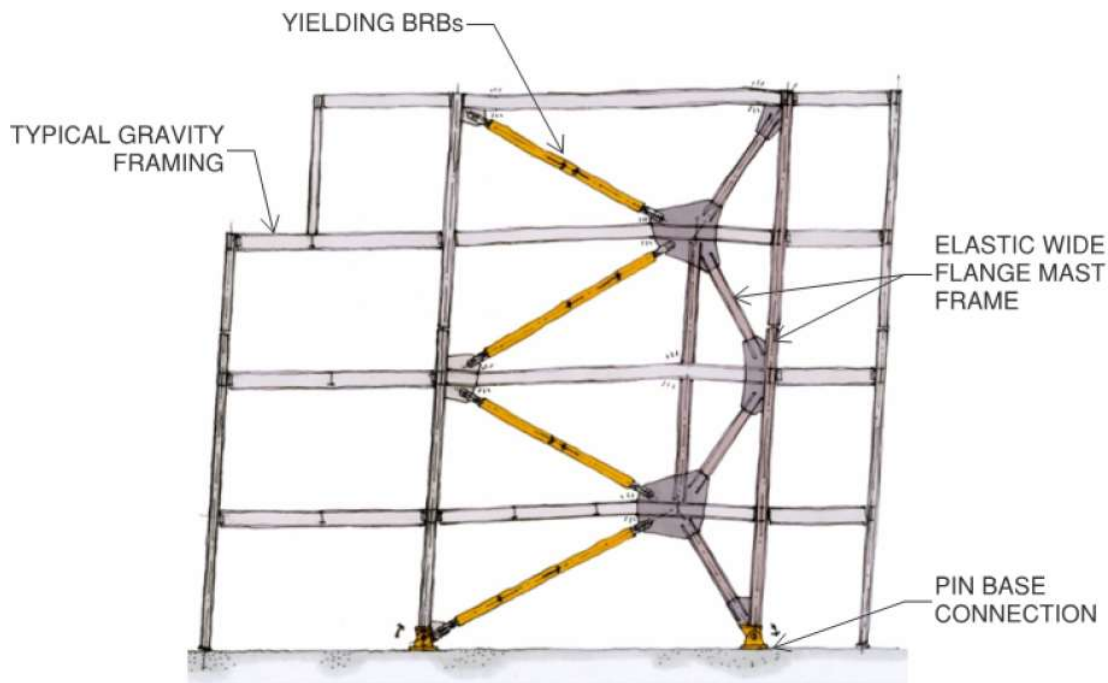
BRBM frame elevation (Panian, Bucci, & Janhunnen, 2015)
